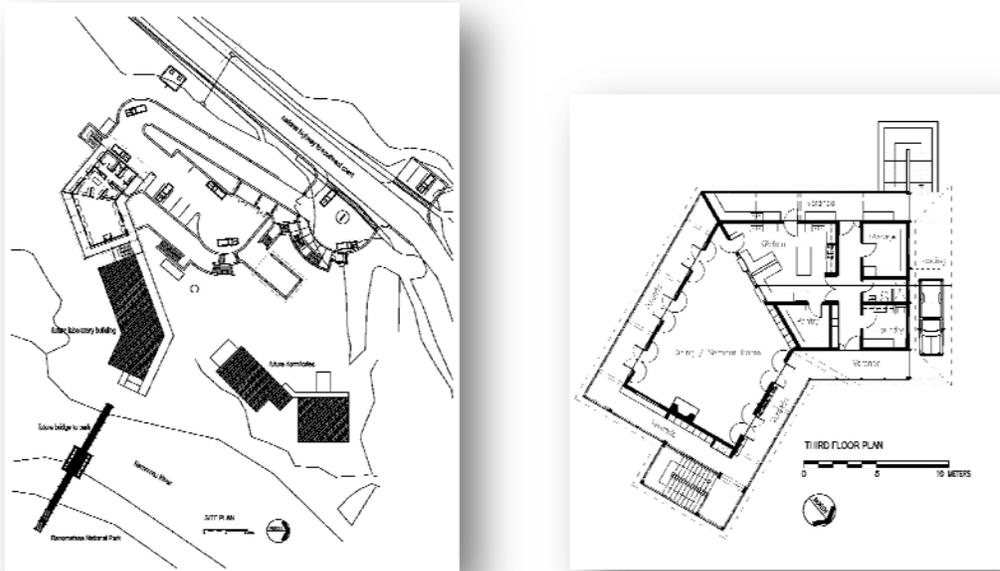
Madagascar: site plan and third floor plan of Centre ValBio. Source: Fieldwork.
